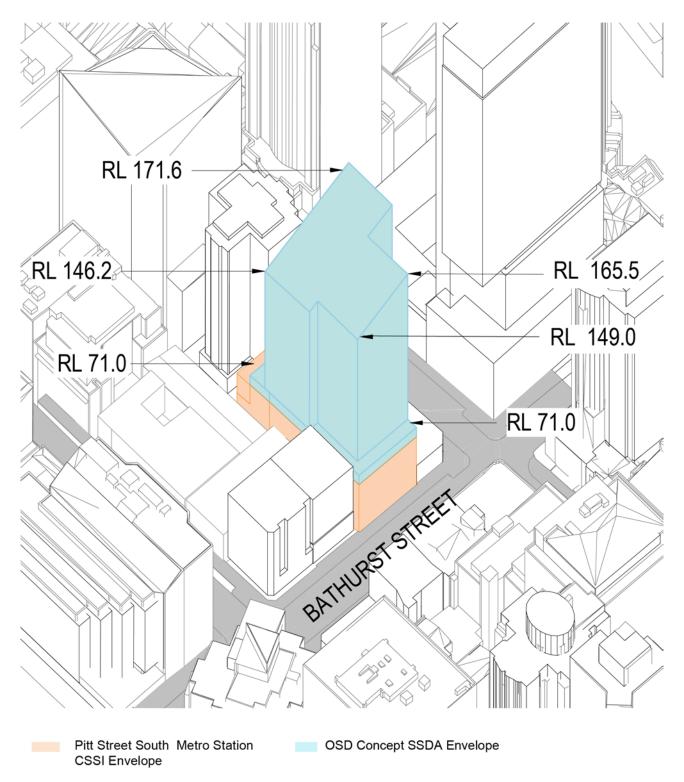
Proposed Pitt Street South OSD building envelope (axonometric diagram from north east)
